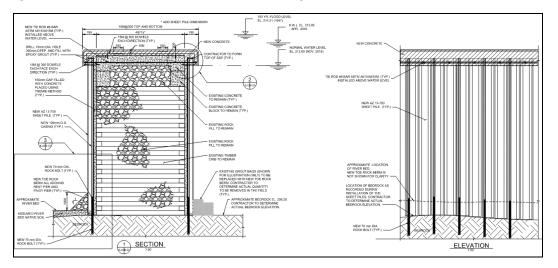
Rest Piers Rehabilitation and Retrofitting with Sheet Piles
